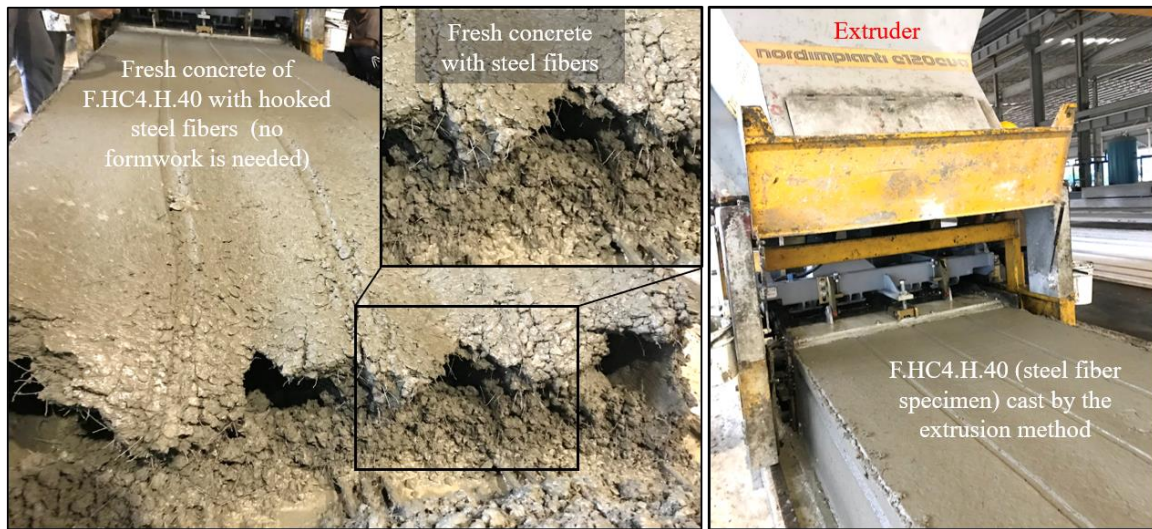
Casting hollow core specimen with steel fibers using the extrusion method
